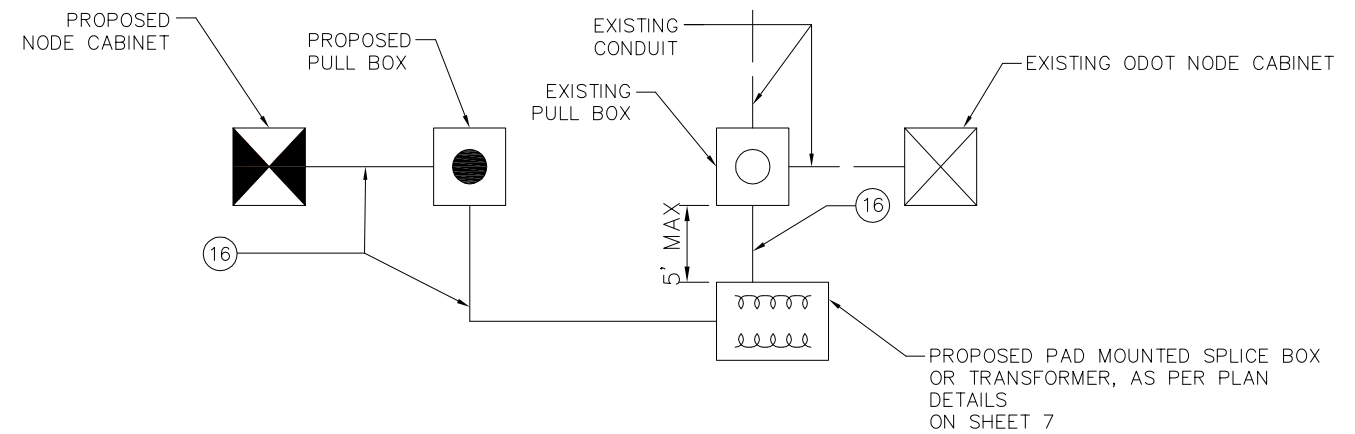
POWER SERVICE TYPE D, AS PER PLAN
